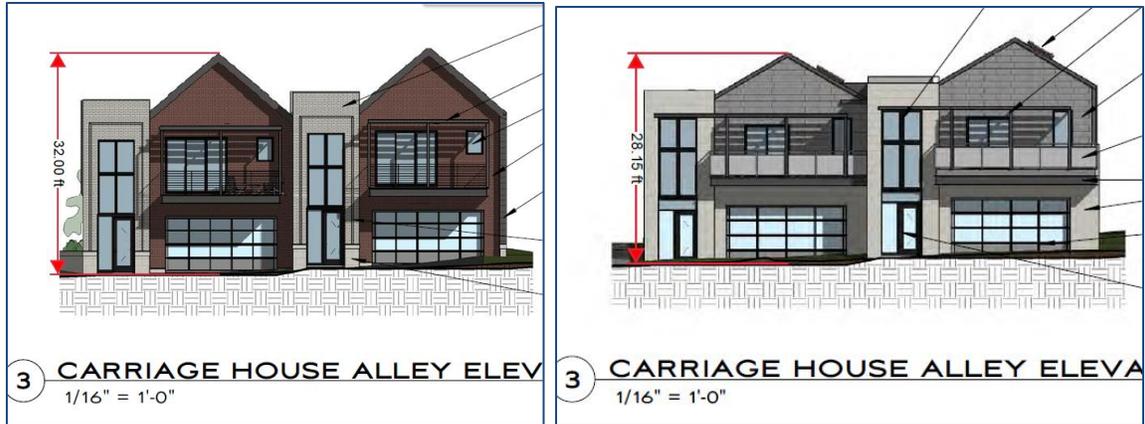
(Left) is the proposed revision to the alley townhouses. Figure 11 (Right) is the previously approved plan
